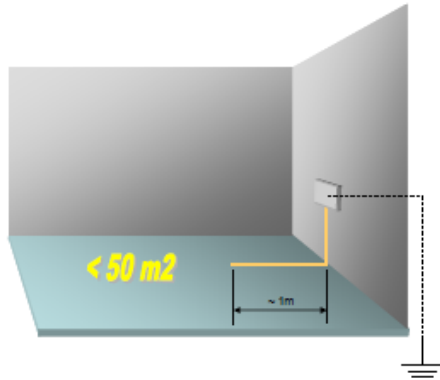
Copper strip layout for rooms < 50 m<sup>2</sup>
